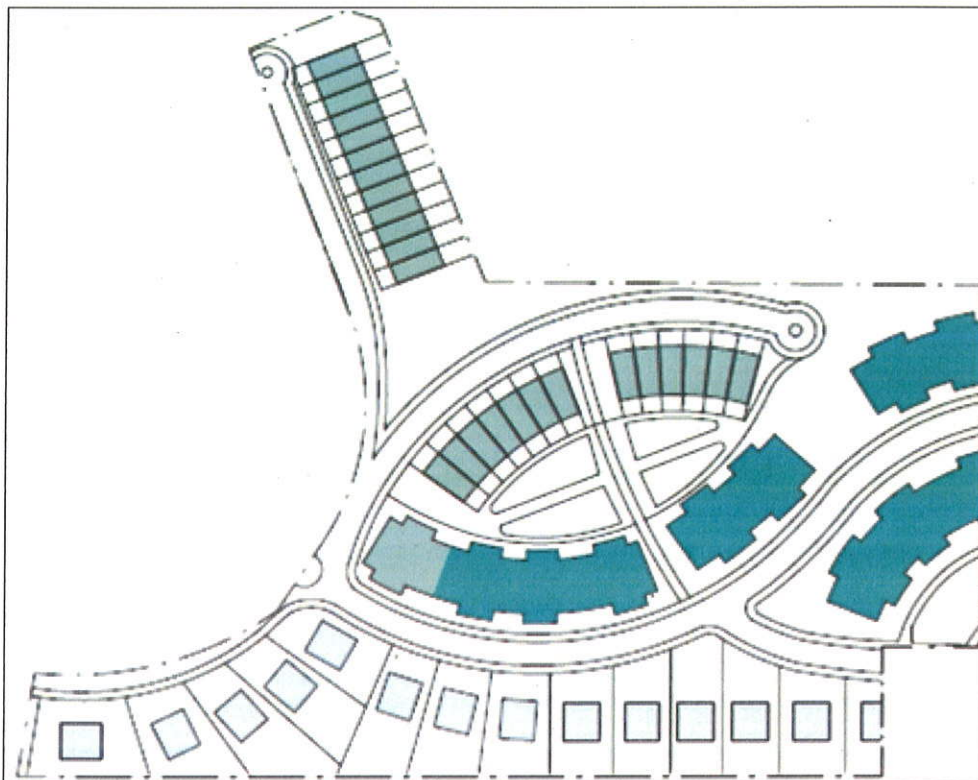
Concept Plan layout for Stage 1 Phase 1 area
